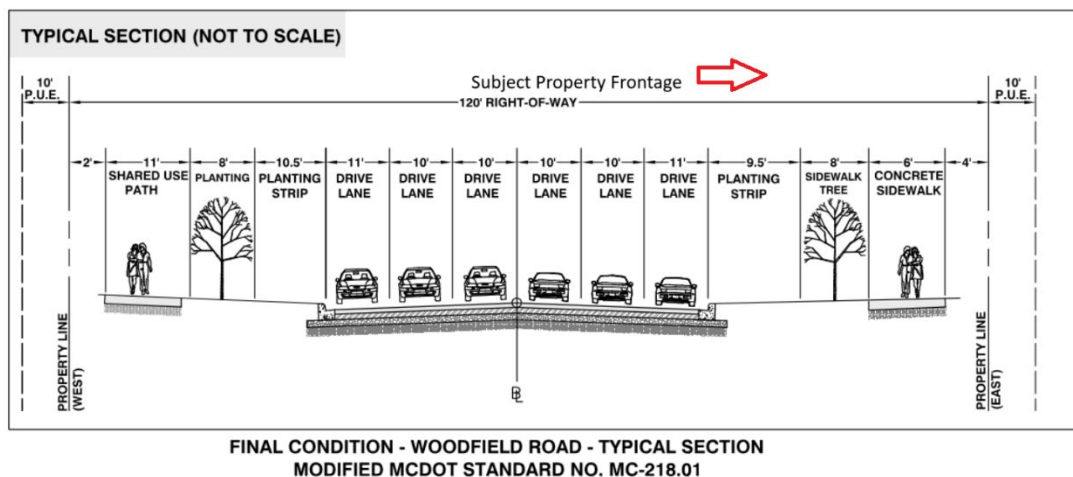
Final Condition Cross Section per the 2023 Master Plan of Highways and Transitways
